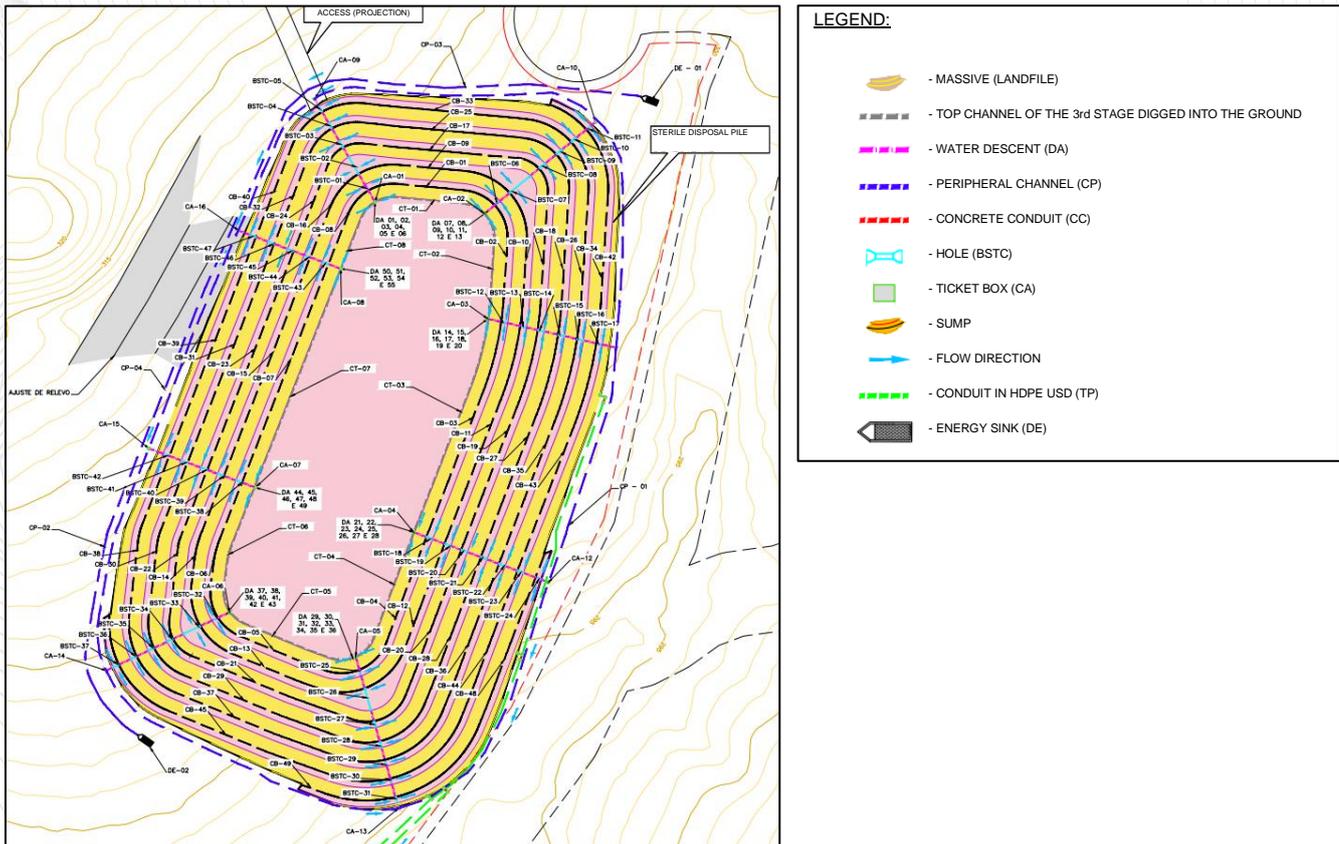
Plant Surface drainage sterile stockpile - PDE (GHT, 2022)
